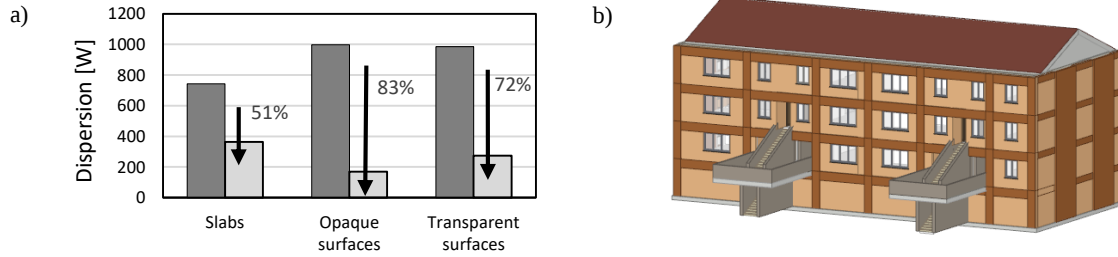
a) External heat loss surface, pre and after retrofit , b) 3D rendering of the building with the cladding façade panels connected to the exoskeleton.
